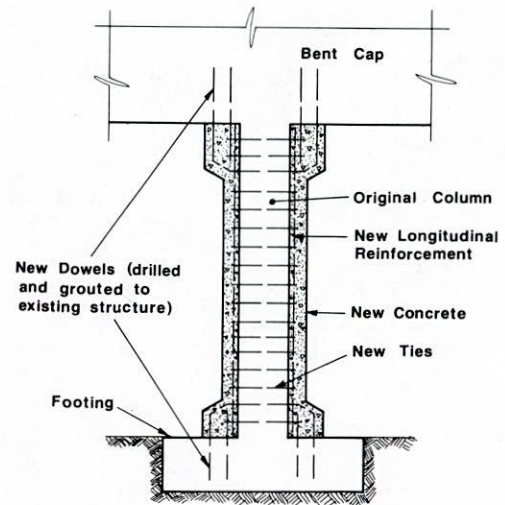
Strengthening a Square or Rectangular Reinforced Concrete Column
